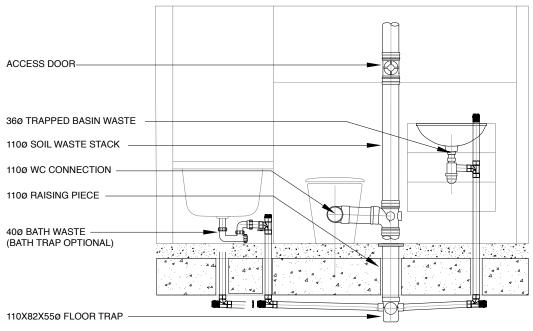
DETAIL A To make a direct connection from one floor gully to another floor gully is not permitted.
